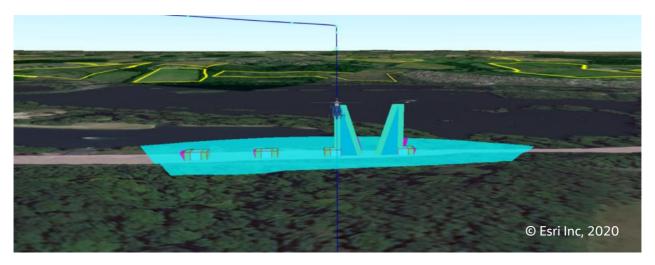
Take-off on Runway 06 - HS2 Construction - Pier cap and pier construction
